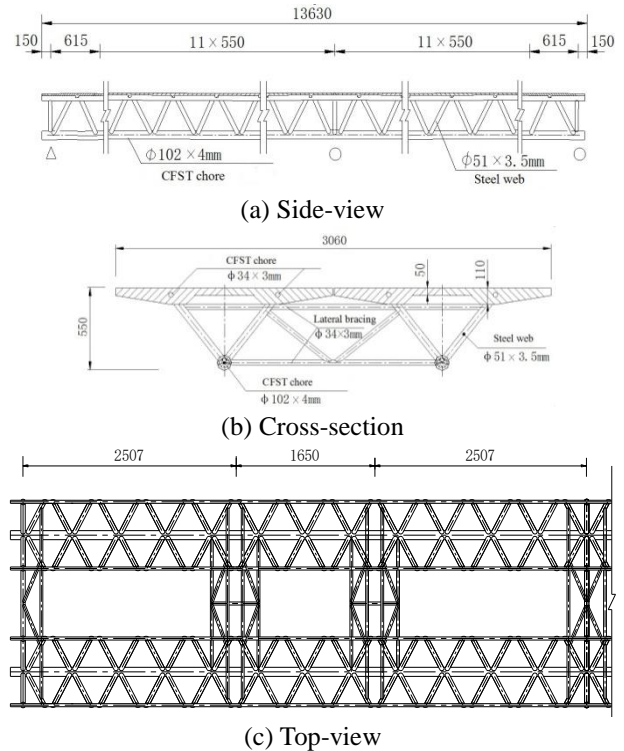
The layout of the experimental CFST truss girder (Unit: mm)
